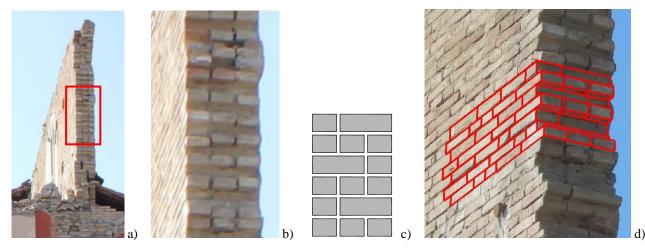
Example of a triple header brick masonry bond in church I3, general view (a), detail (b), sketch of the cross section view of the bond type (c) and highlighted detail of the side and the cross section view of the bond type (d).
